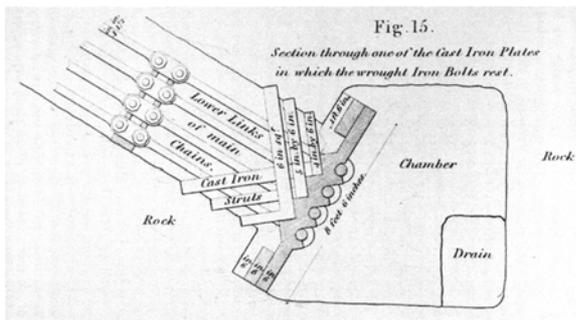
Anchorage as built for the Menai Suspension Bridge. (Penfold, after Provis)
